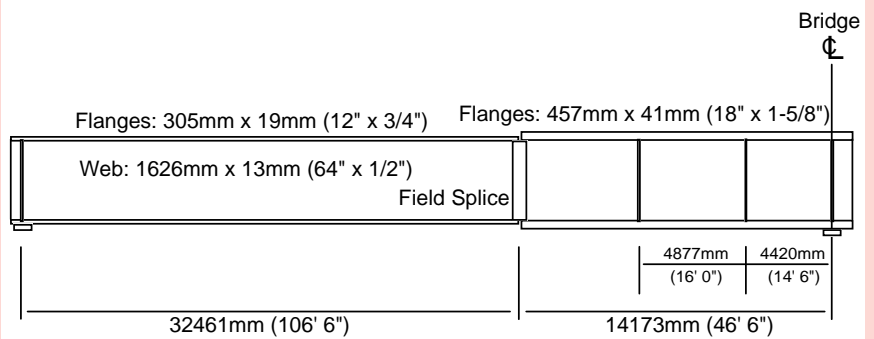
Elevation View of 9 Girder HPS Steel Bridge
